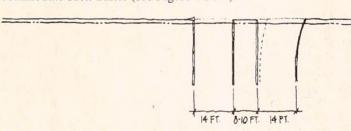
Typical Driveway Standards for Truck Access
